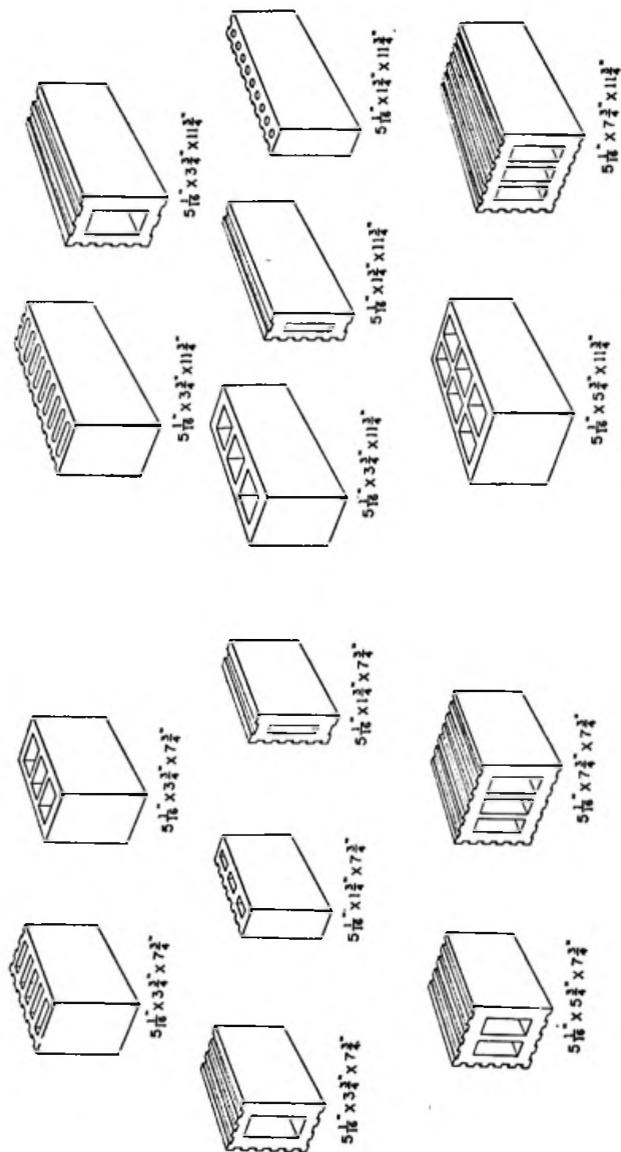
MODULAR SIZES OF STRUCTURAL-CLAY FACING TILE
